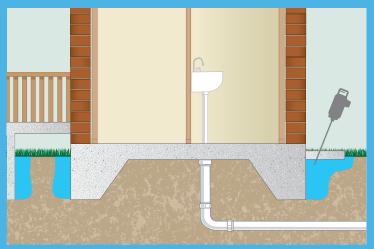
Shows the application of ALTRISET to the soil around the exterior foundation.
